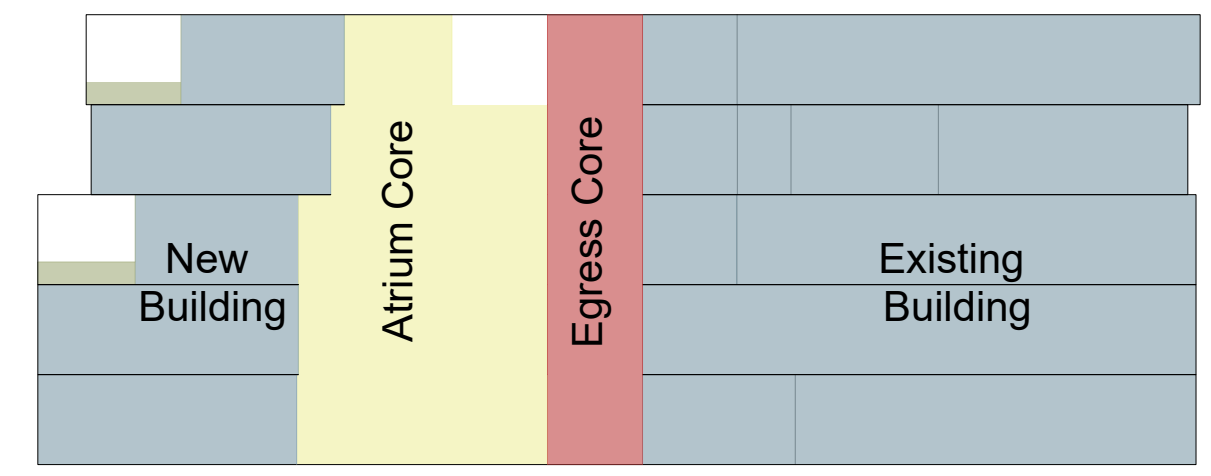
Program Section, Main Atrium Showcasing Separation Between New Building and Existing Building
